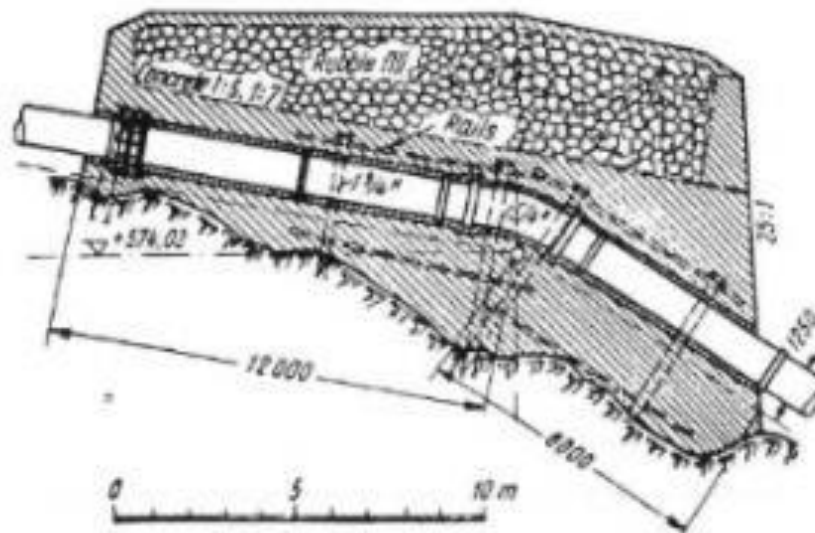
/93. Anchor block loaded by rock fill, Rjukan power plant, Norway. (After A. Ludin)
